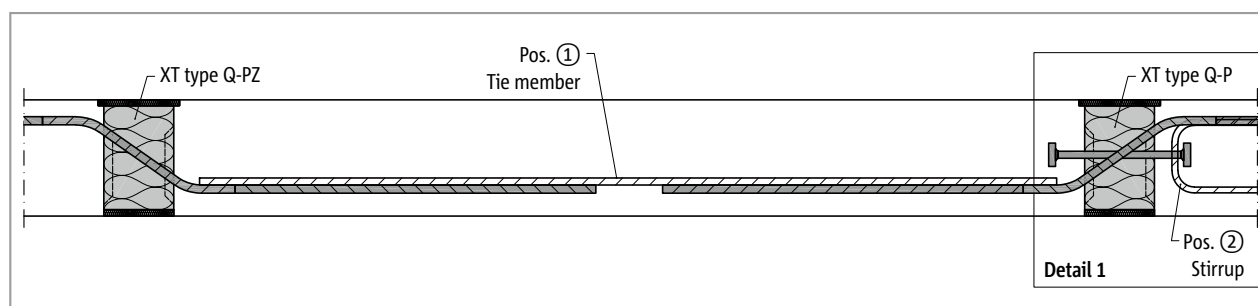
Schöck Isokorb® XT type Q-PZ, Q-P: Section A-A; Tie member connection
